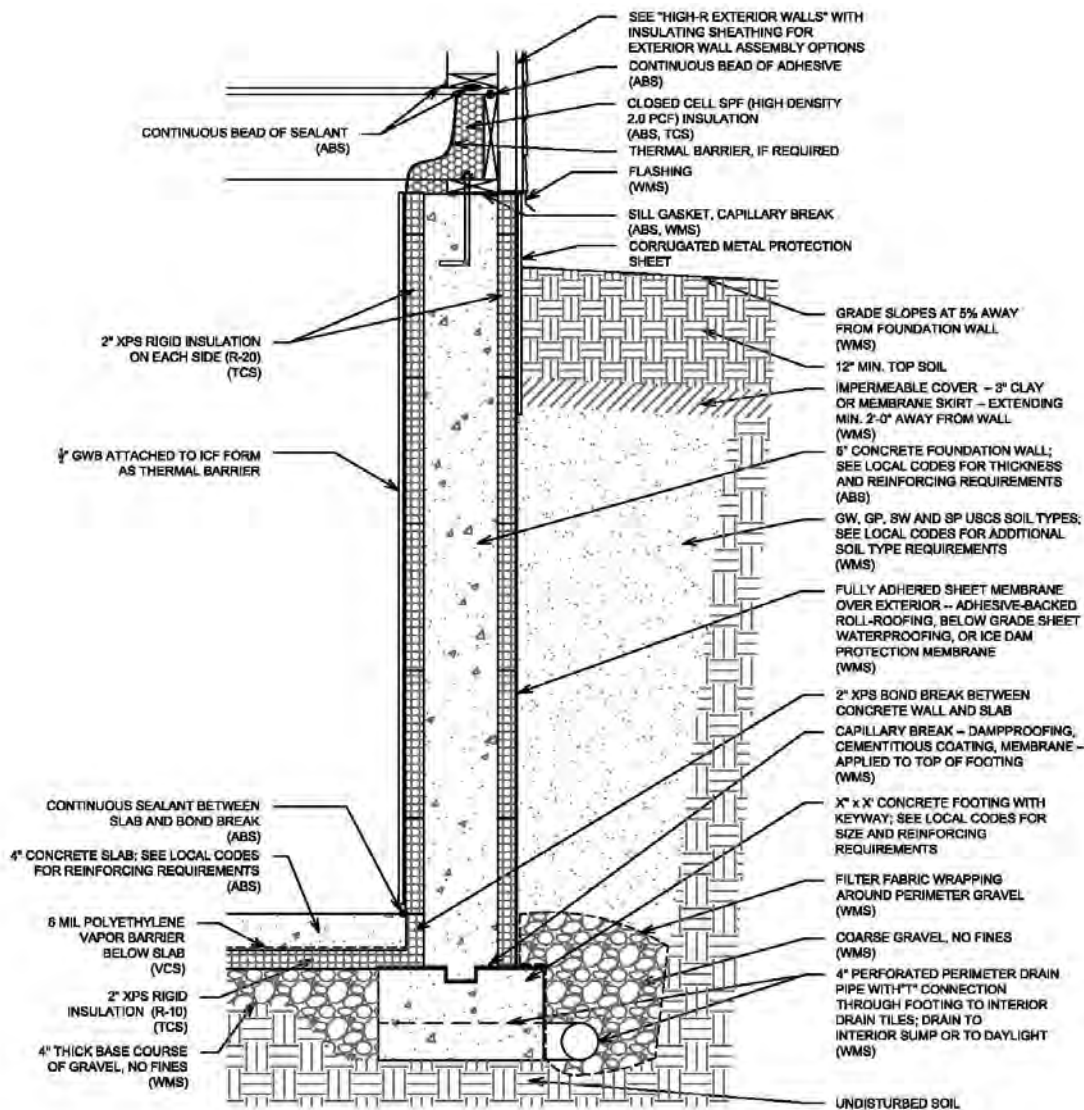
Case 13 Detailed Drawing – Recommended Foundation Wall System
